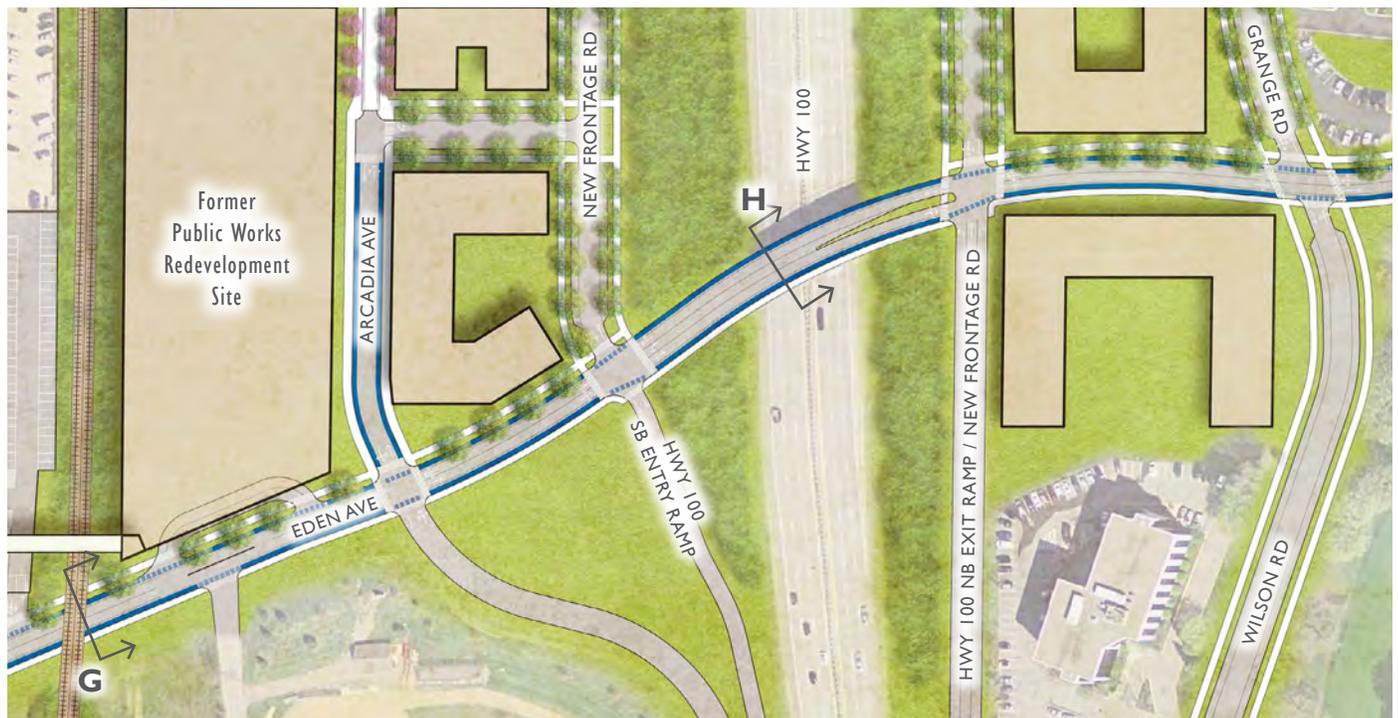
Proposed plan of Eden Avenue; 1" = 200'.
